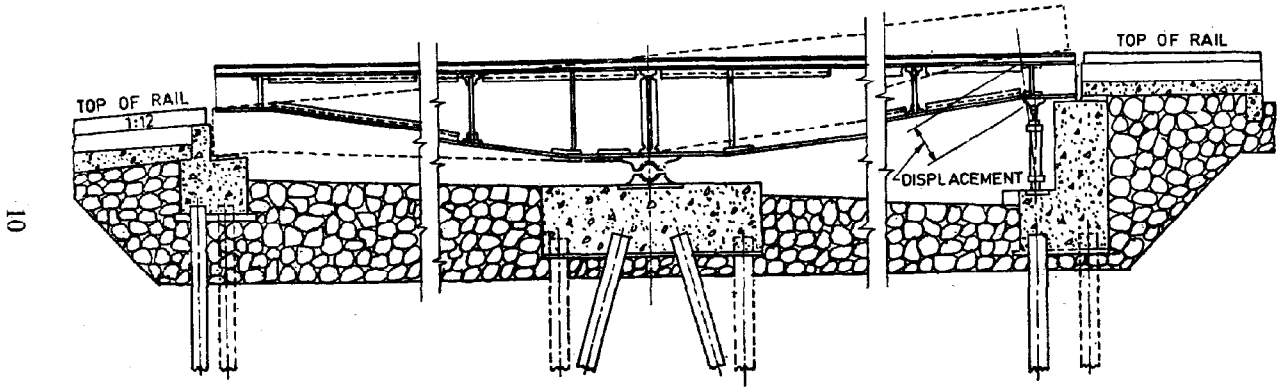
TILTING BRIDGE WITH TWO DOUBLE ACTING HYDRAULIC JACKS
